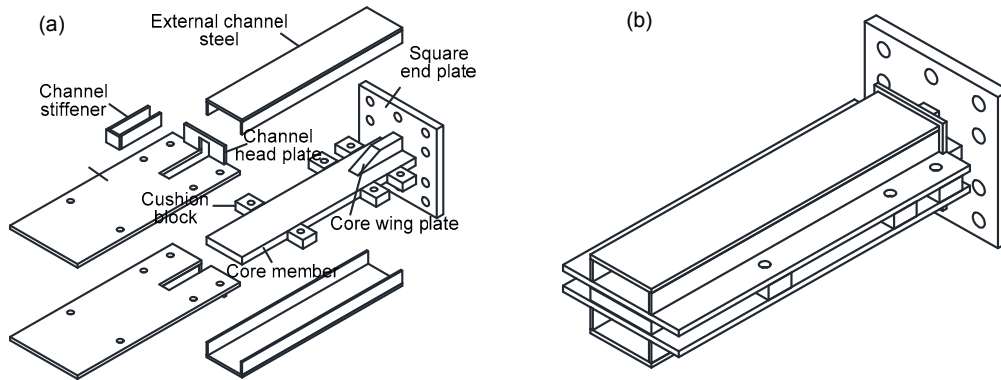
Construction details of specimens: (a) exploded view; (b) assembly drawing
